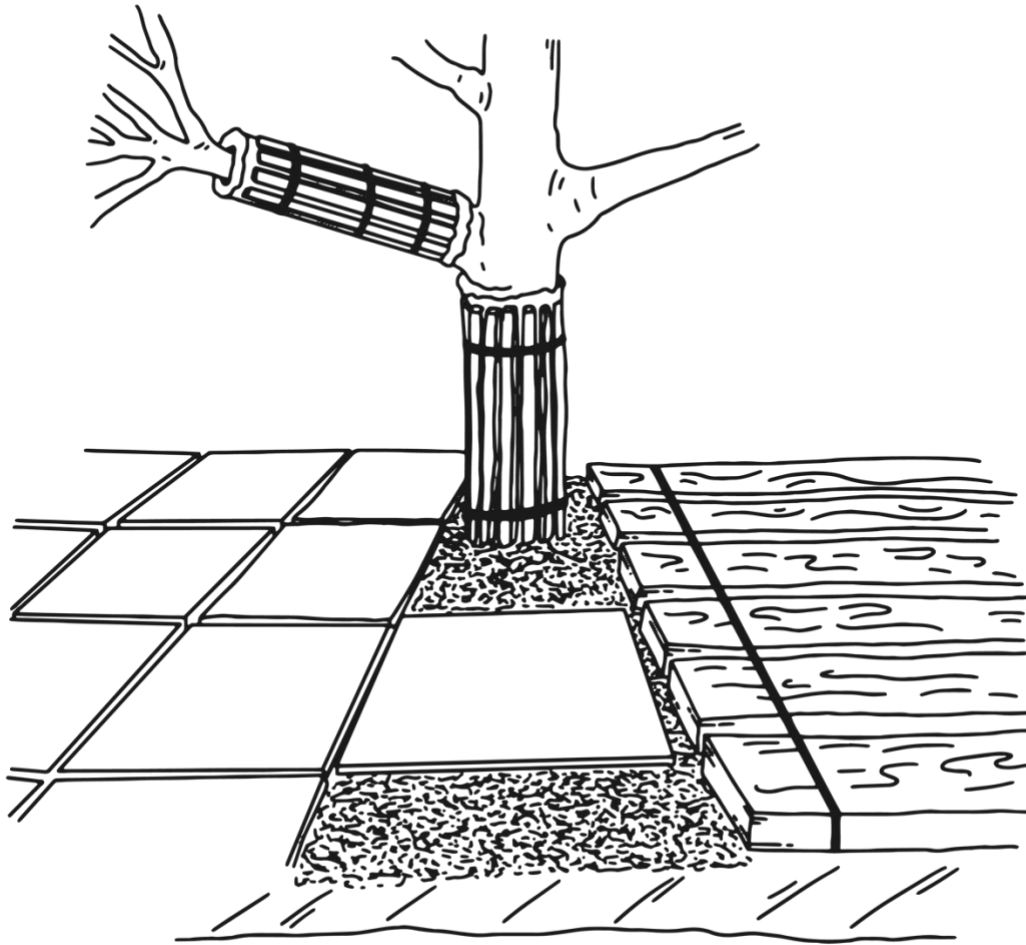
trunk, cambium and branch protection with ground protection methods and examples
